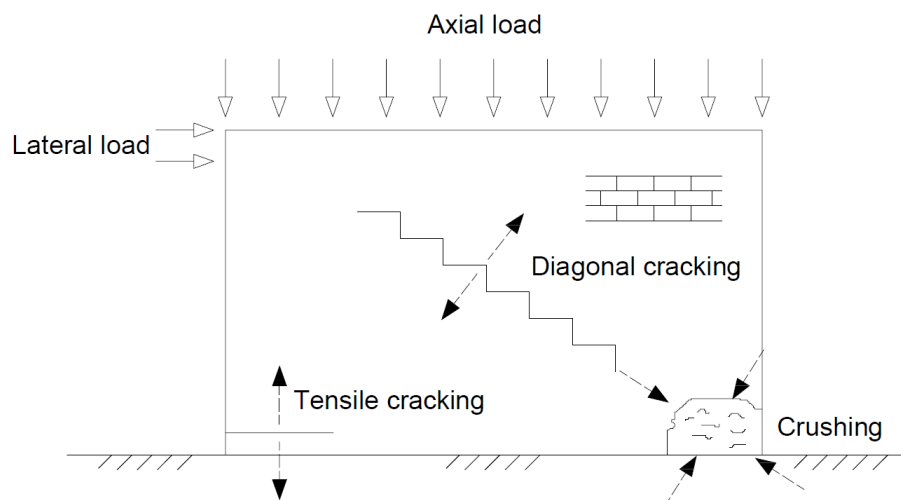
Typical cracking patterns of wall in the pushover test [Haa09]
